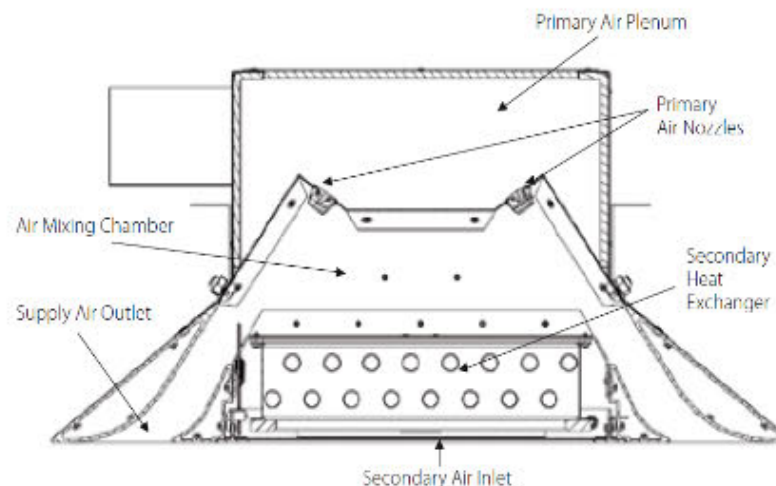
Typical Construction of Active chilled beam Unit [10]
